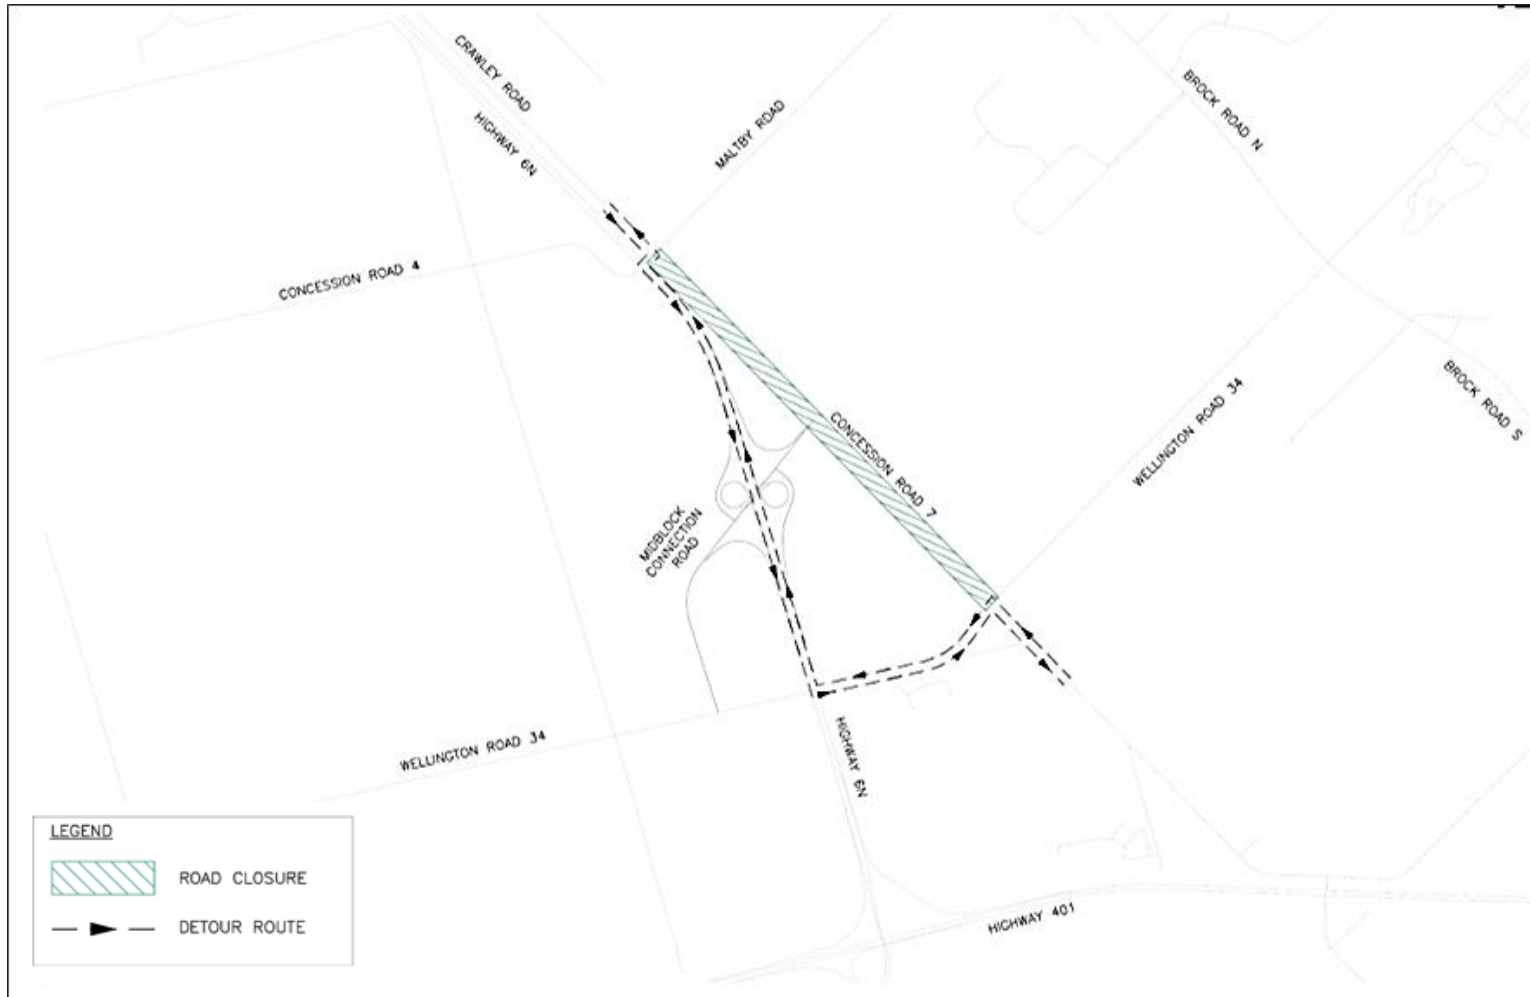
Detour Route for the Construction of Concession Road 7 and roundabout (Remaining Works)
